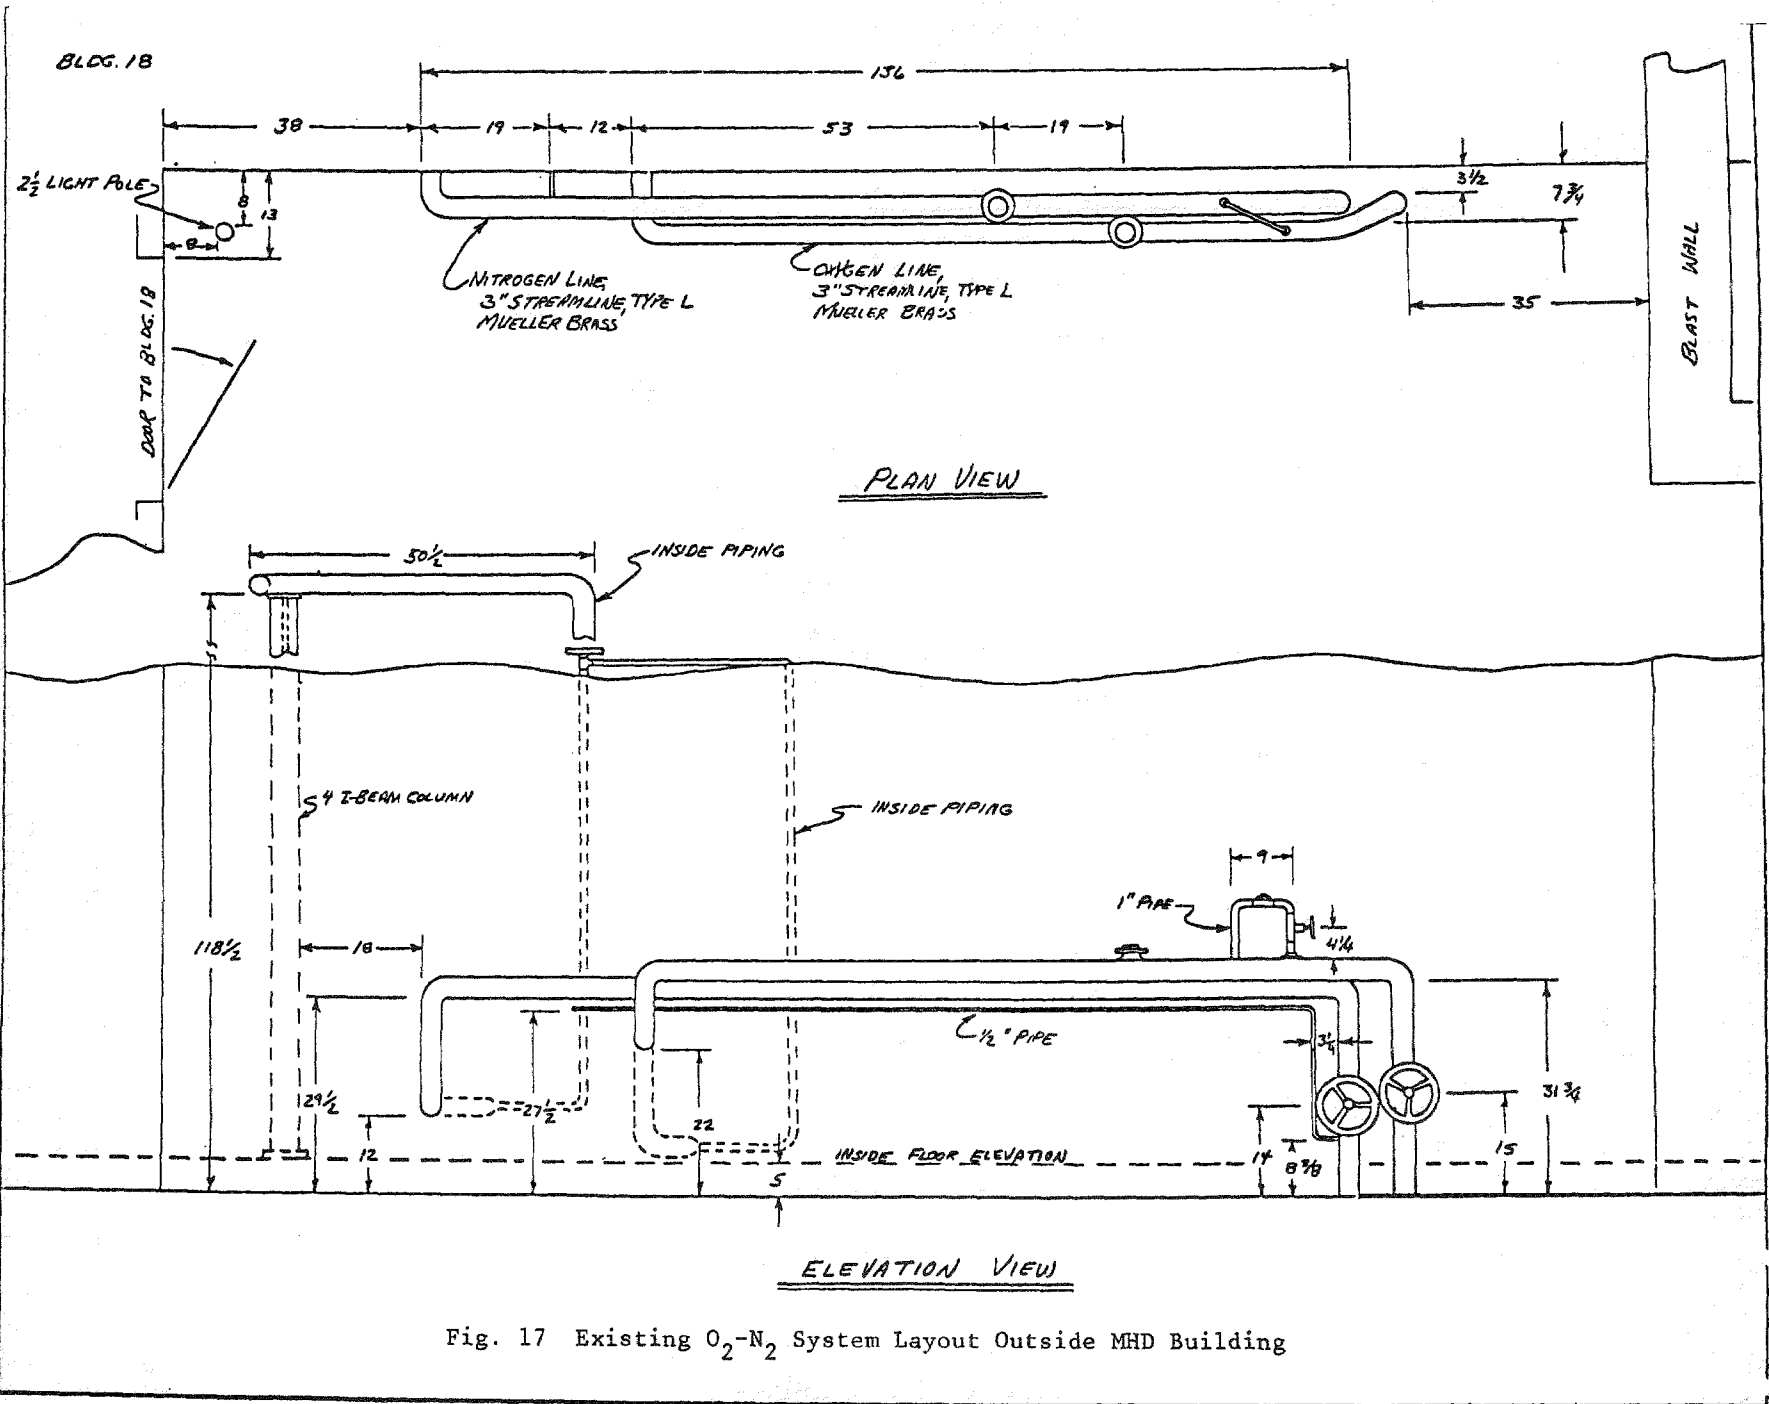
Existing O₂-N₂ System Layout Outside MHD Building
